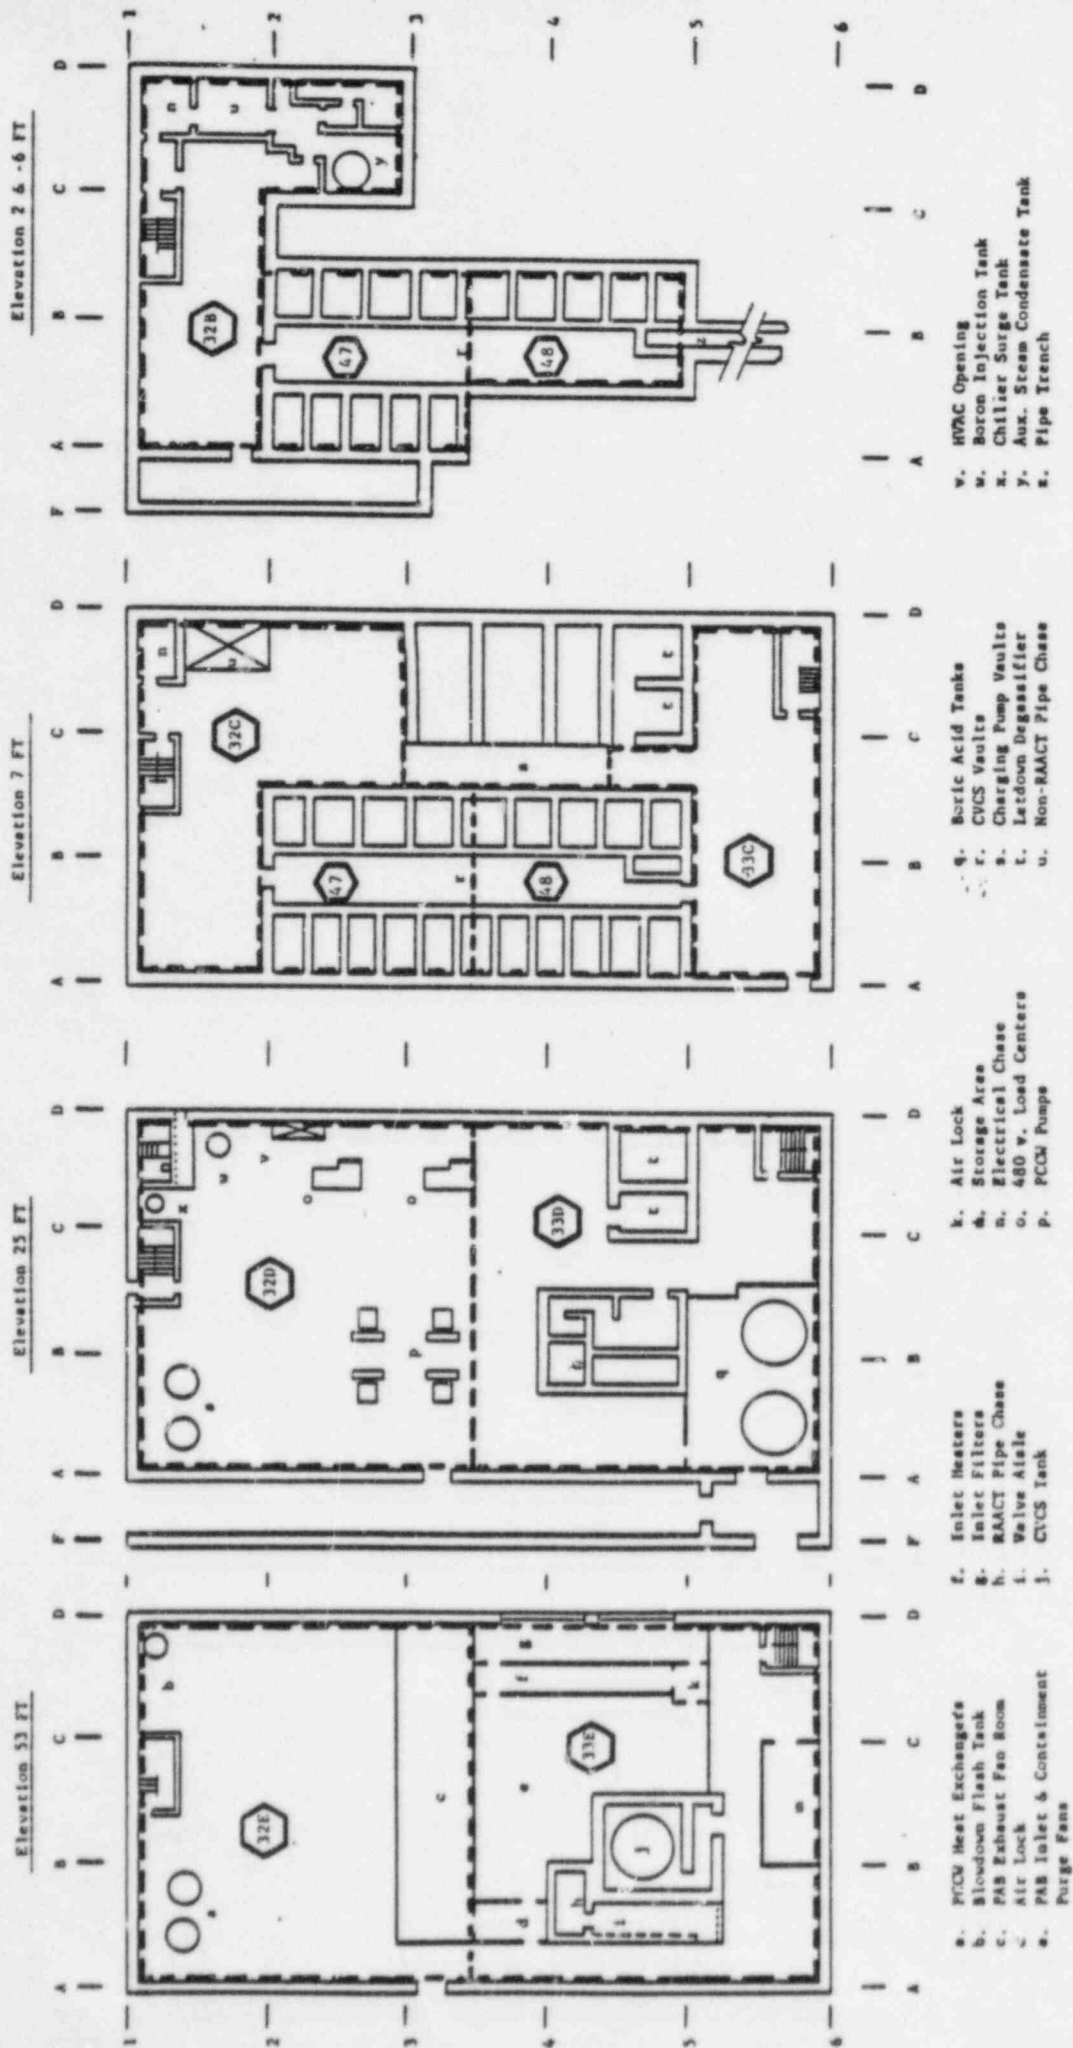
Zone Designations of Primary Auxiliary Building at Various Elevations
